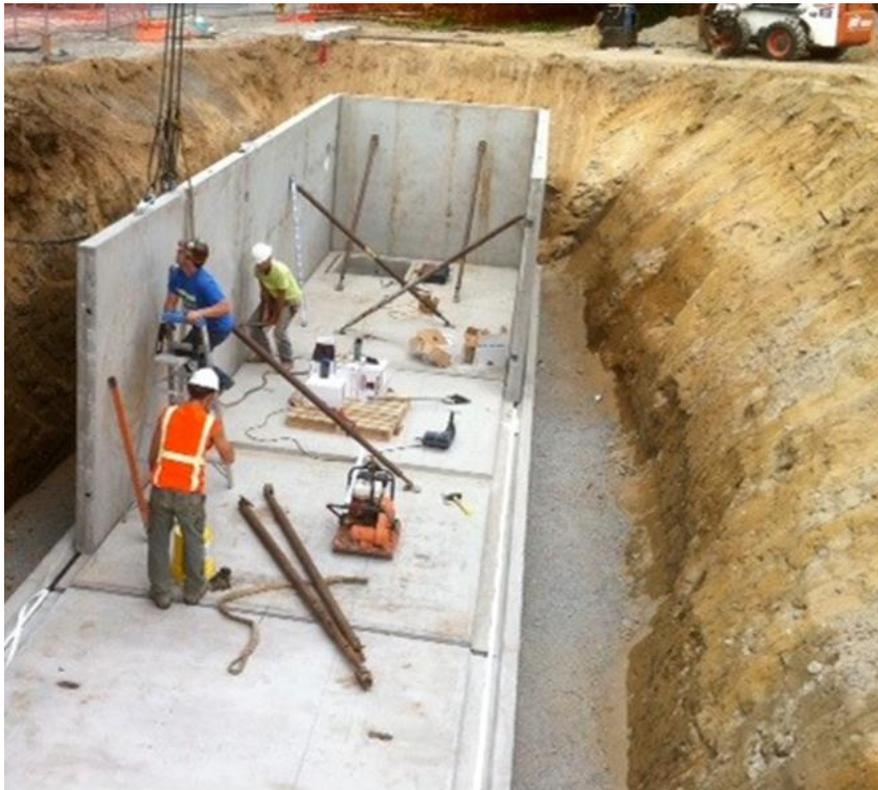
Stormwater facility vault may require significant tree clearing, excavation, and land area on a small, single family residential lot.
